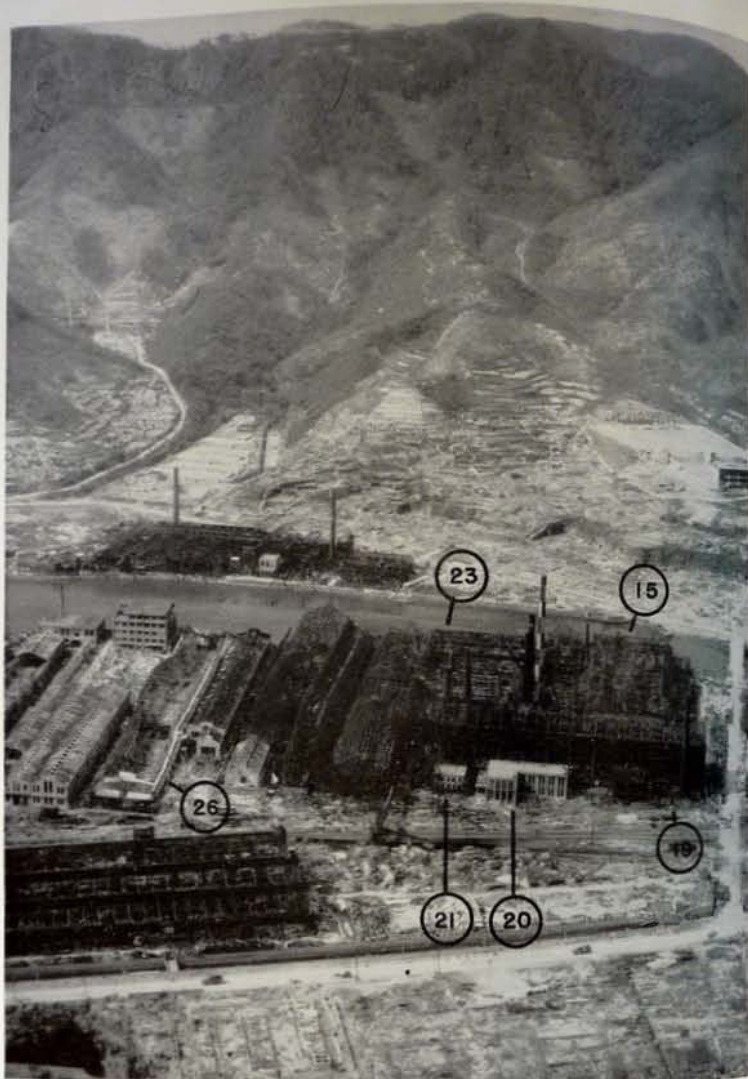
4,000 feet from GZ. Group 26. Looking west at central portion of Mitsubishi Steel and Arms Works. Group 31 (casting plant) can be seen across the river.
